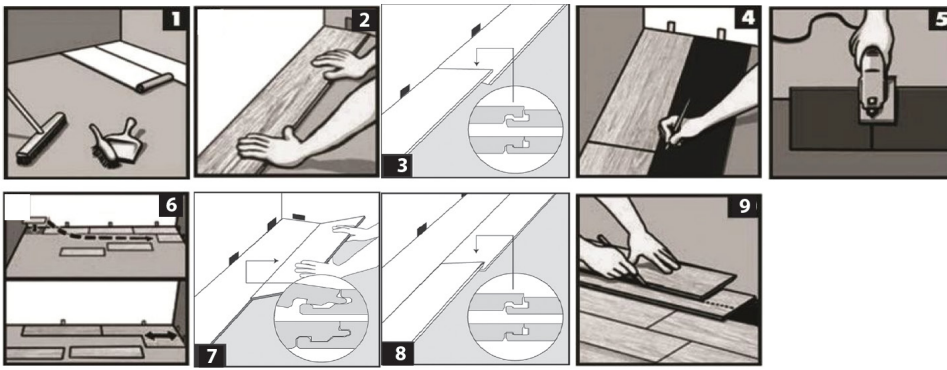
If you are using a sabre saw, or other type of power saw, place the plank face down on the work area and cut to size. If you are cutting with a hand saw, use a fine tooth blade and cut the plank with the face up. Insert the cut plank into the row and use a pry bar to ease the plank into position.
